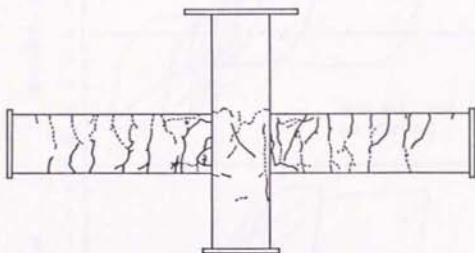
Crack Patterns at End of Test (Specimen J6)
